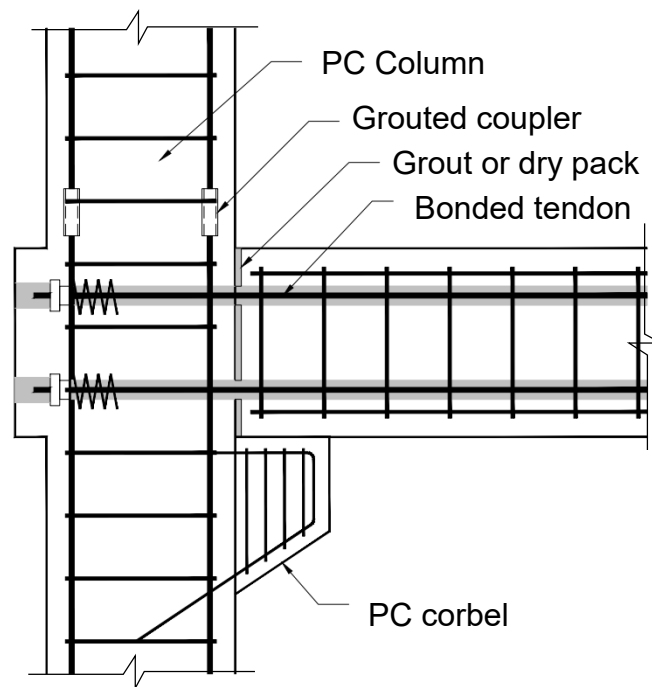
SYSTEM-2: SUPPORTED PRECAST BEAM ELEMENTS POST-TENSIONED BETWEEN COLUMNS
